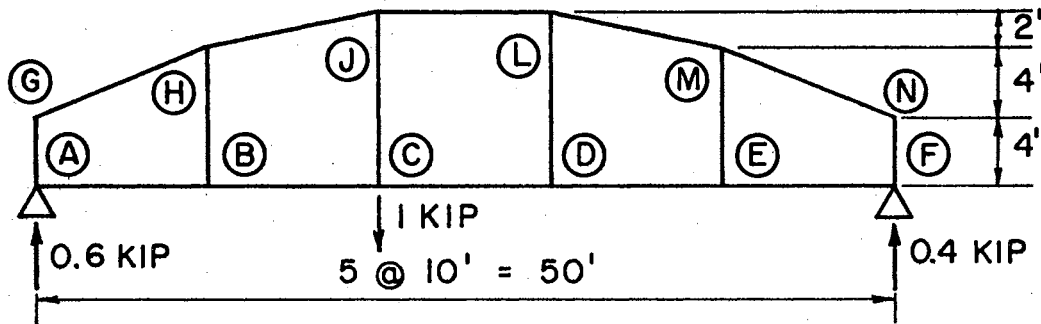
Single Span Vierendeel Truss with Inclined Chords.
